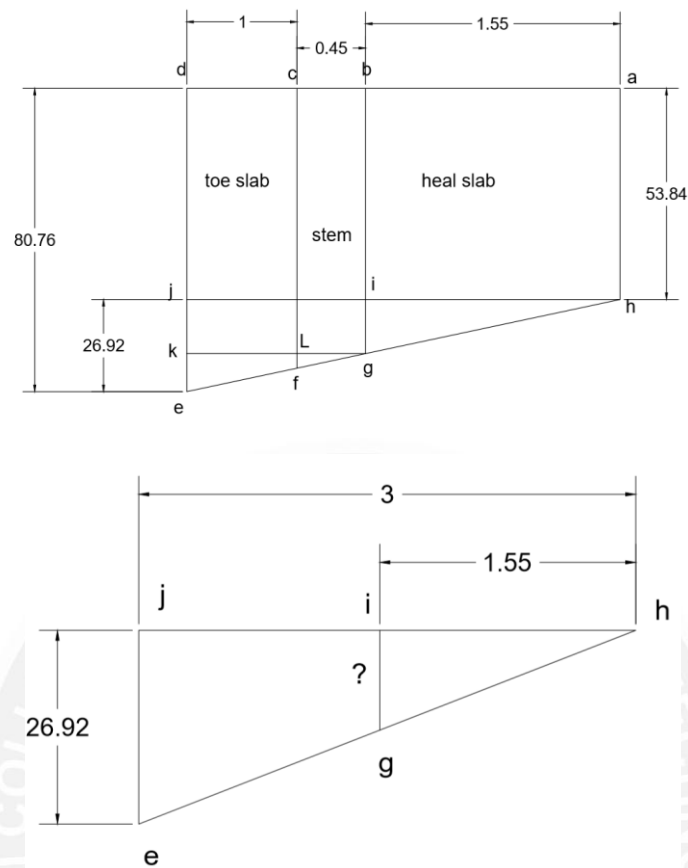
Cantilever retaining wall (Heal slab Top view)
